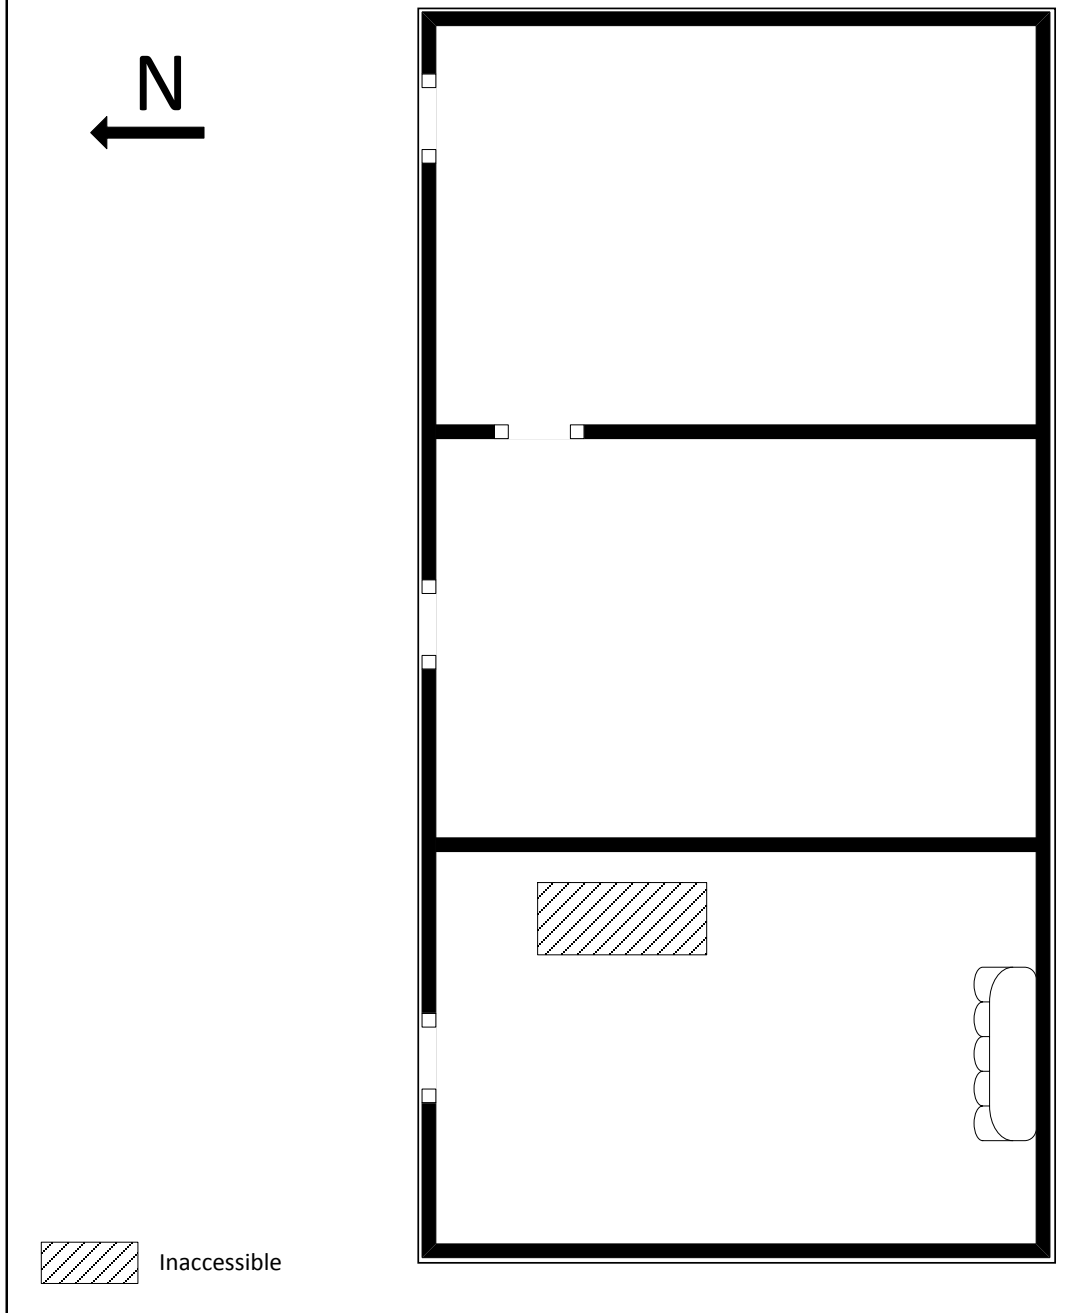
Hangar 10 Bay Floor and Room Below Room 103
